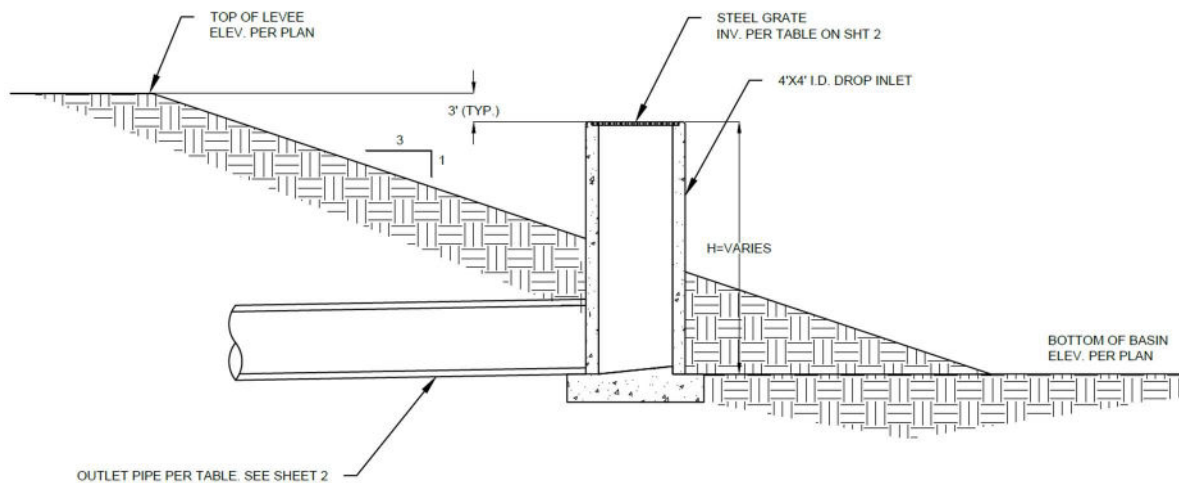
Typical Drop Inlet for Basin Outlet Structure
